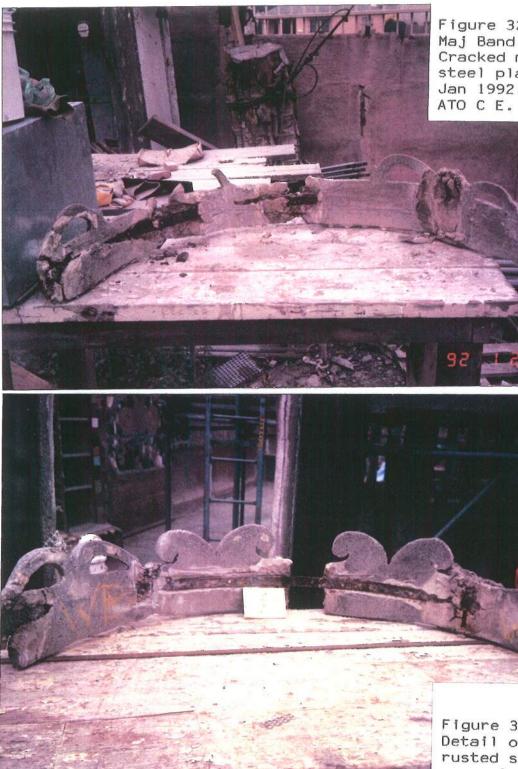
Maj Band 03 after removal. Cracked mortar and rusted steel plate reinforcement. Jan 1992. ATO C E.
